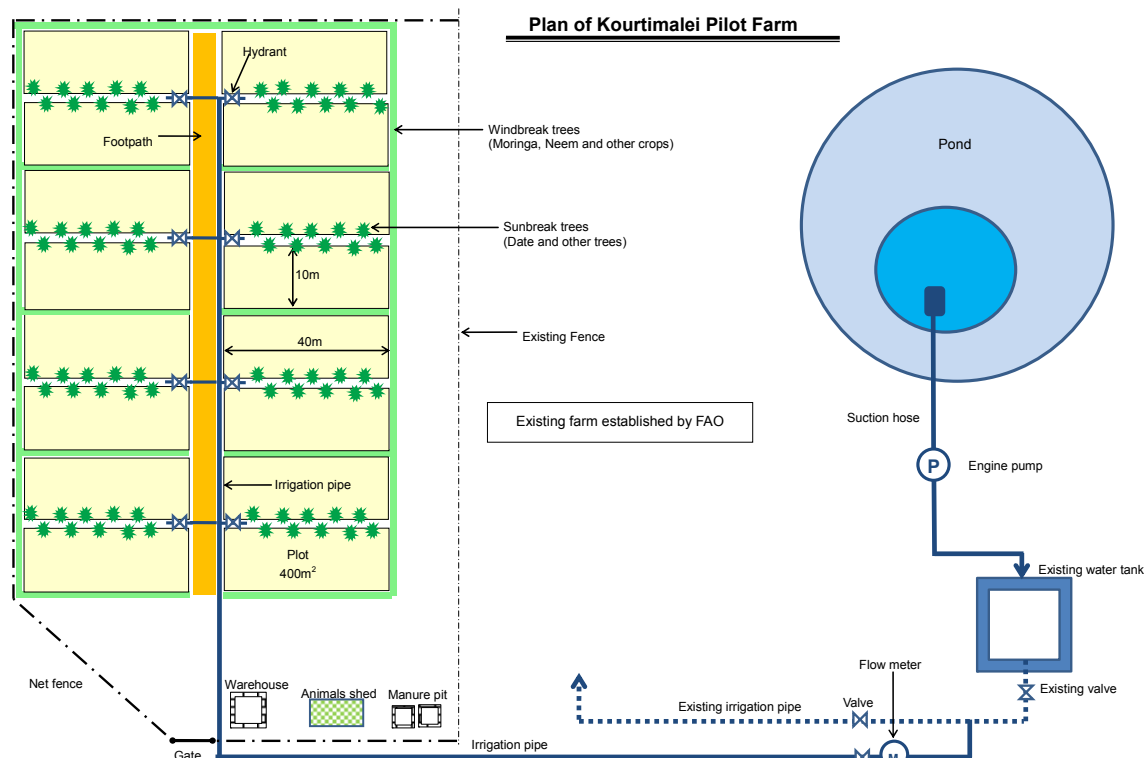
Layout of Kourtimalei Pilot Farm
